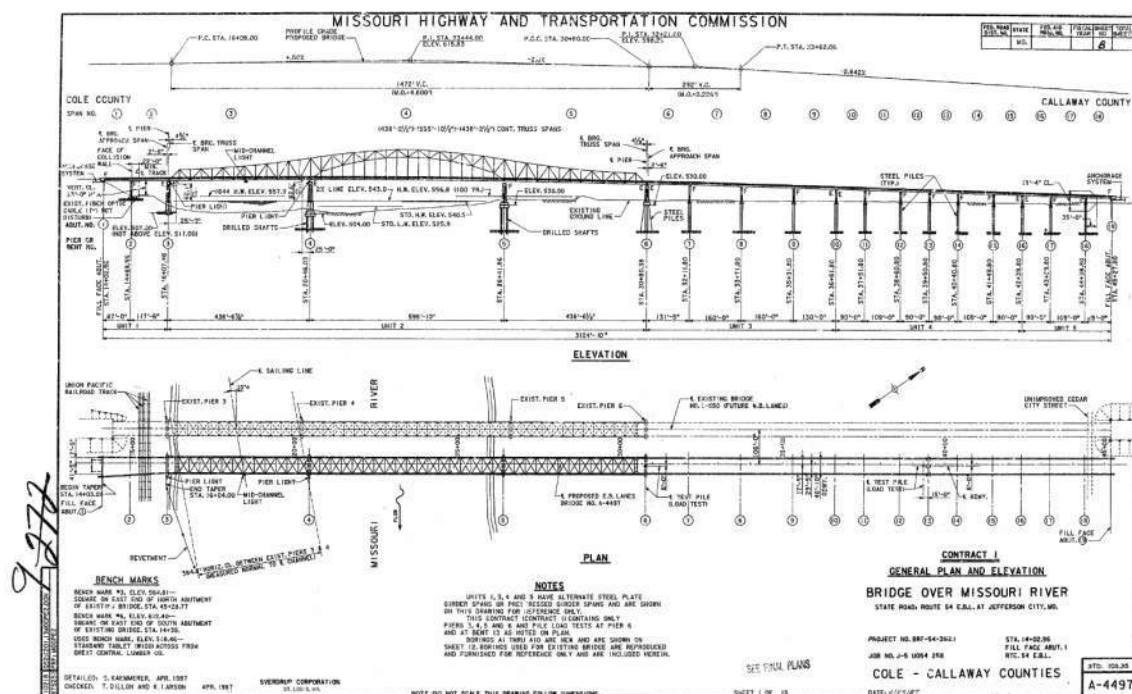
A4497 Bridge General Layout (MODOT 1987)
